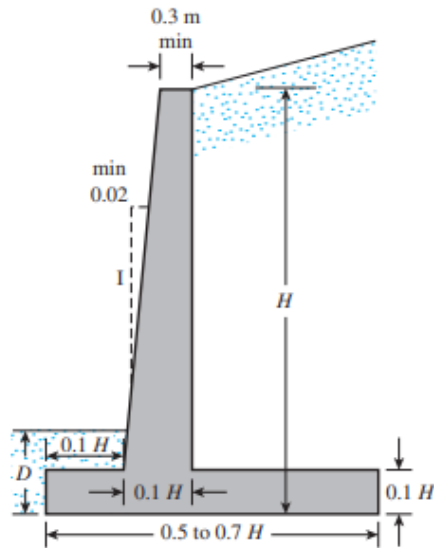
Approximate Dimensions of Cantilever Retaining Wall
